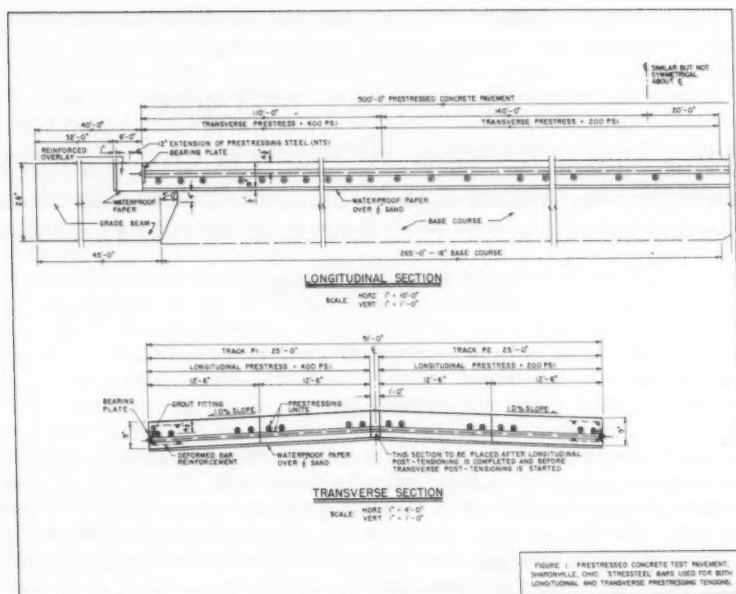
Half longitudinal and full transverse sections of prestressed concrete test pavement.
